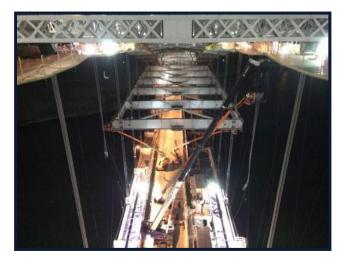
PP10-16 Floor Beam, Edge Girder and Wind Bracing
